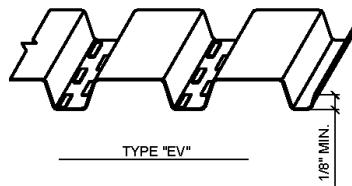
1.5CF, EF, AND EVF COMPOSITE FLOOR DECK-SLAB
